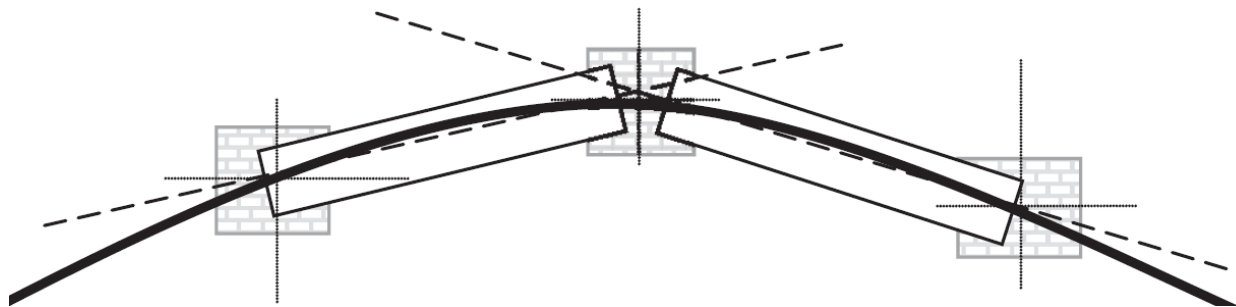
Plan of a curved track (bold line) carried by straight girder bridge curved in plan (Unsworth 2010).
